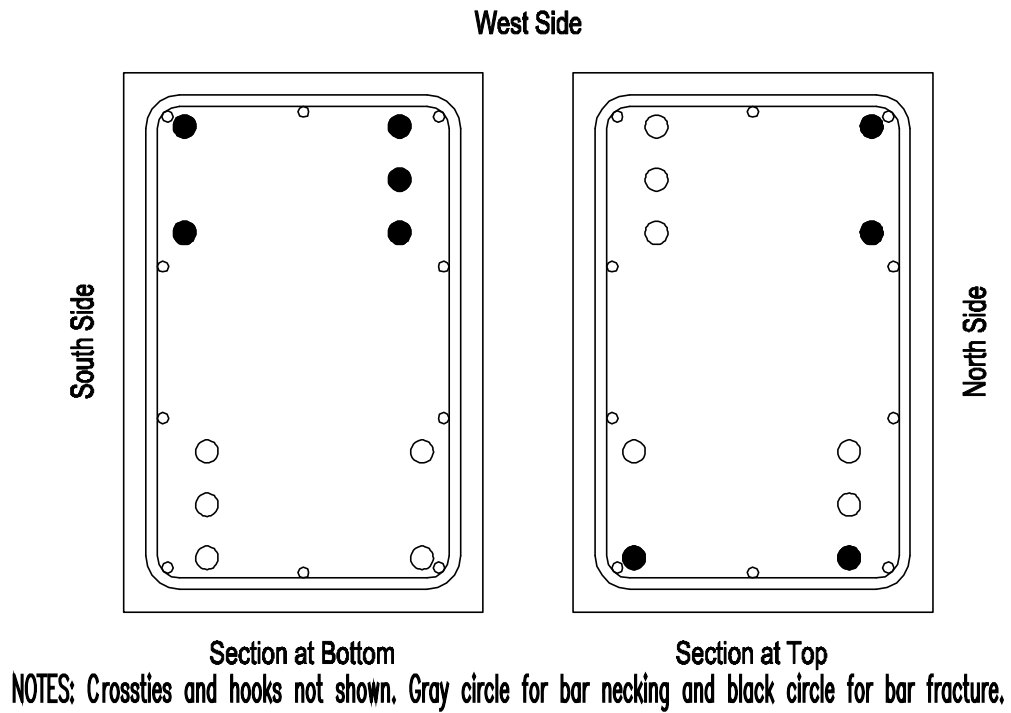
Reinforcing bar fracture locations, D100-1.5
